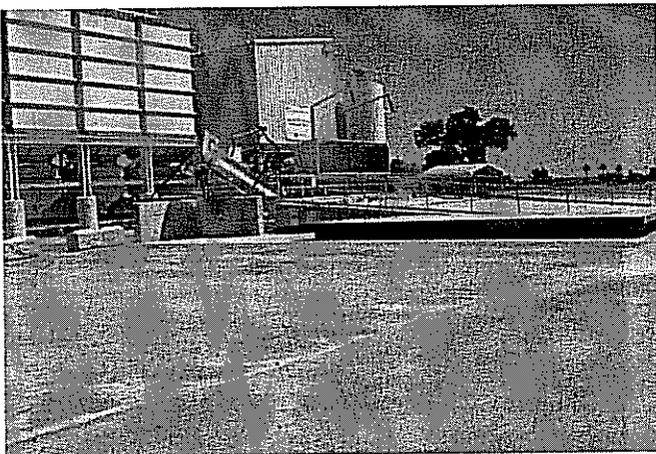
A portion of the onsite batch plant Note: the facility uses wet concrete and does not produce dry concrete forms Note: the facility also has a concrete reclaimer
